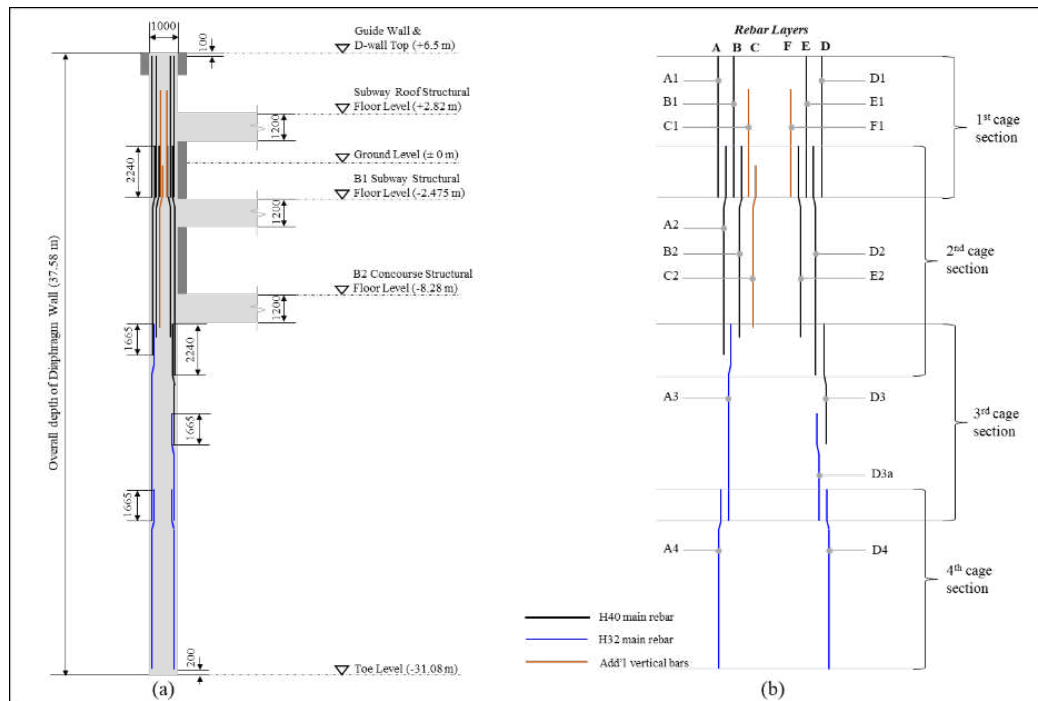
Vertical rebar arrangement of a diaphragm wall panel. (a) Cross-section. (b) Rebar cage sections. (Adapt from: Rachmawati et al. [4]).
